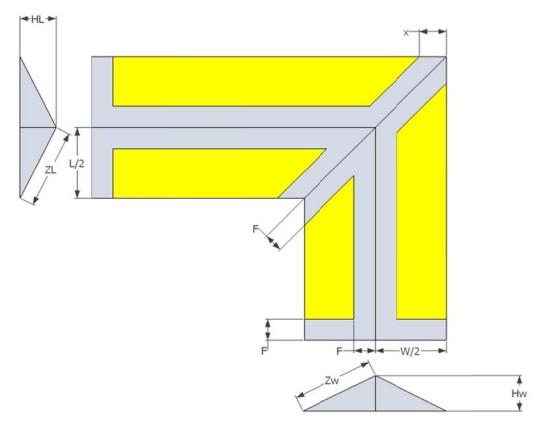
Solar zones and roof cross-sections for an L-shaped roof
